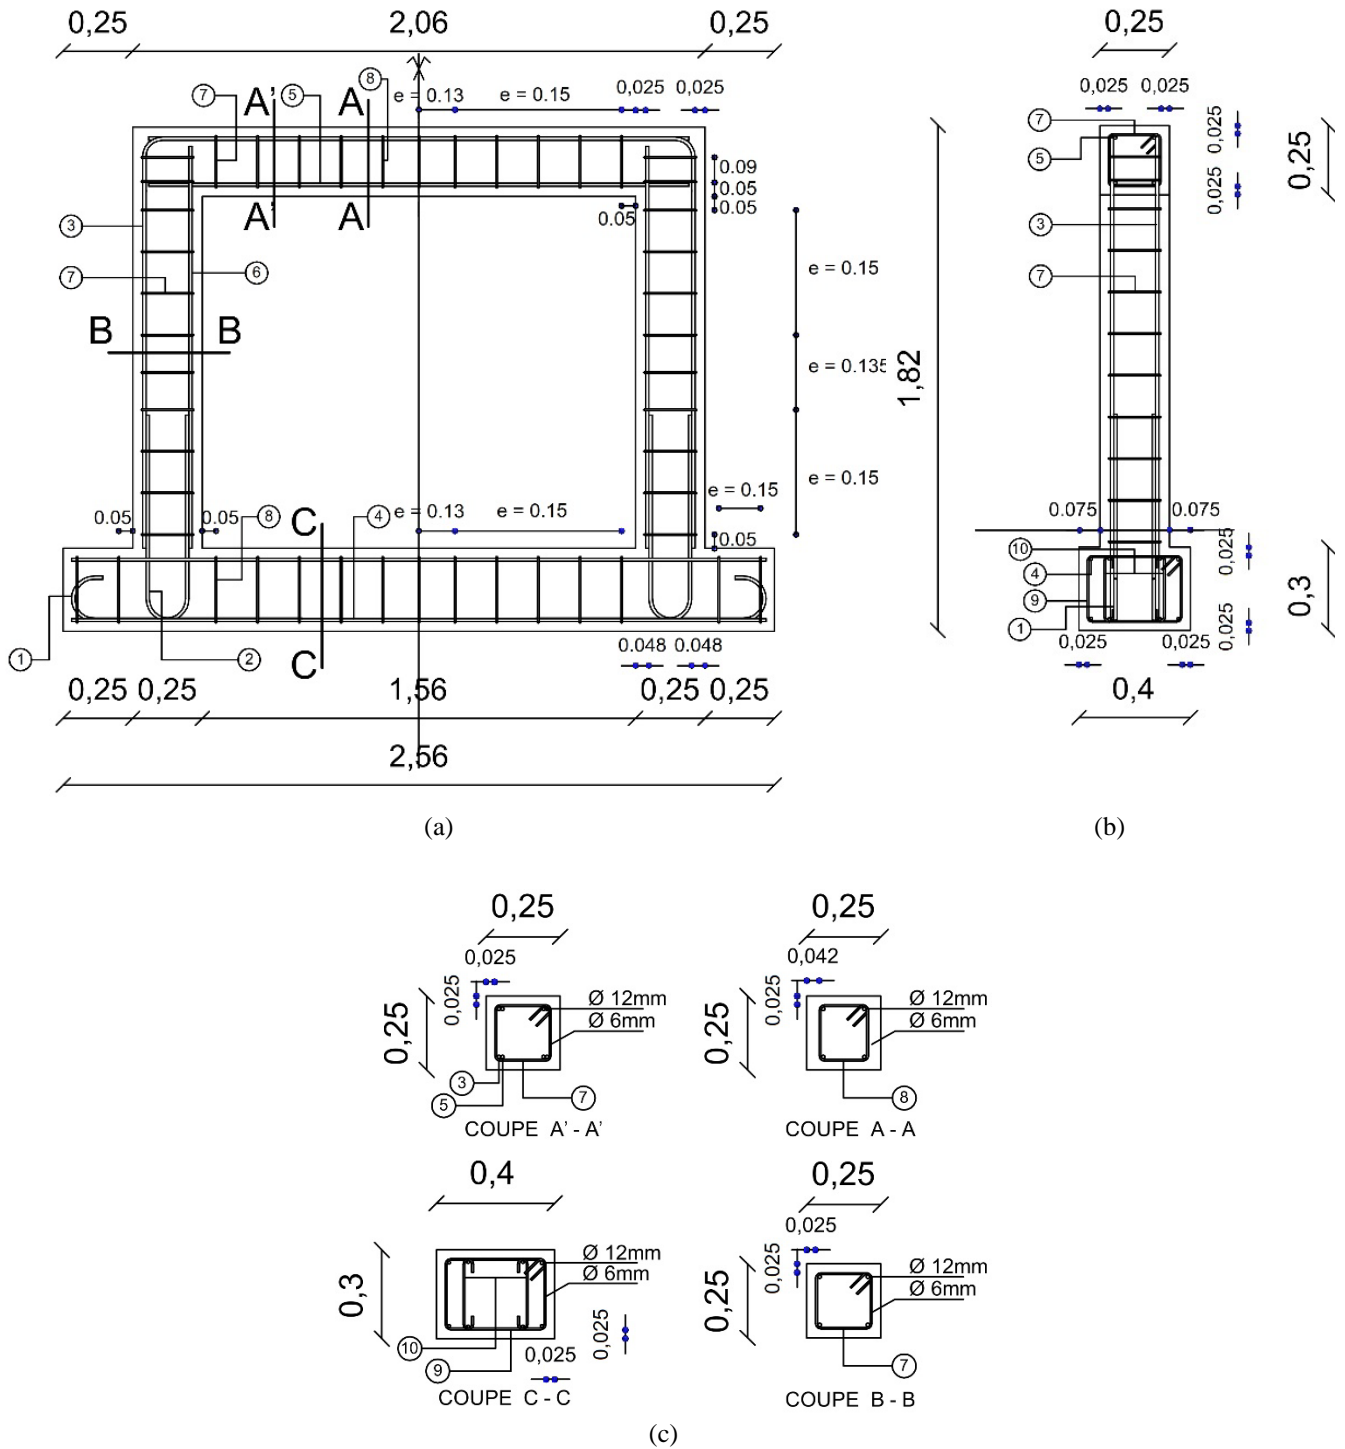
Dimensions and reinforcement details of the specimens tested (dimensions in m) : front view (a), lateral view (b) and sections details (c)
